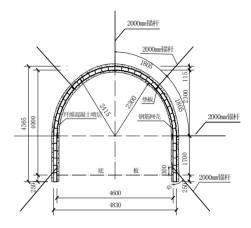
Shell shotcrete construction in drift 图 9 巷道网壳喷层施工图
